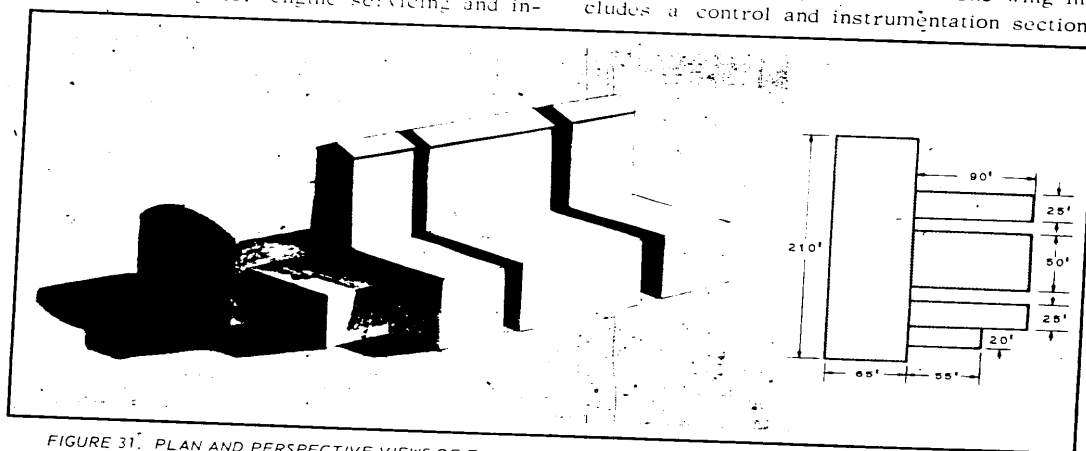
PLAN AND PERSPECTIVE VIEWS OF ENGINE TEST BUILDING, KU-TIEN-TZU AIRCRAFT ASSEMBLY AND REPAIR PLANT.
